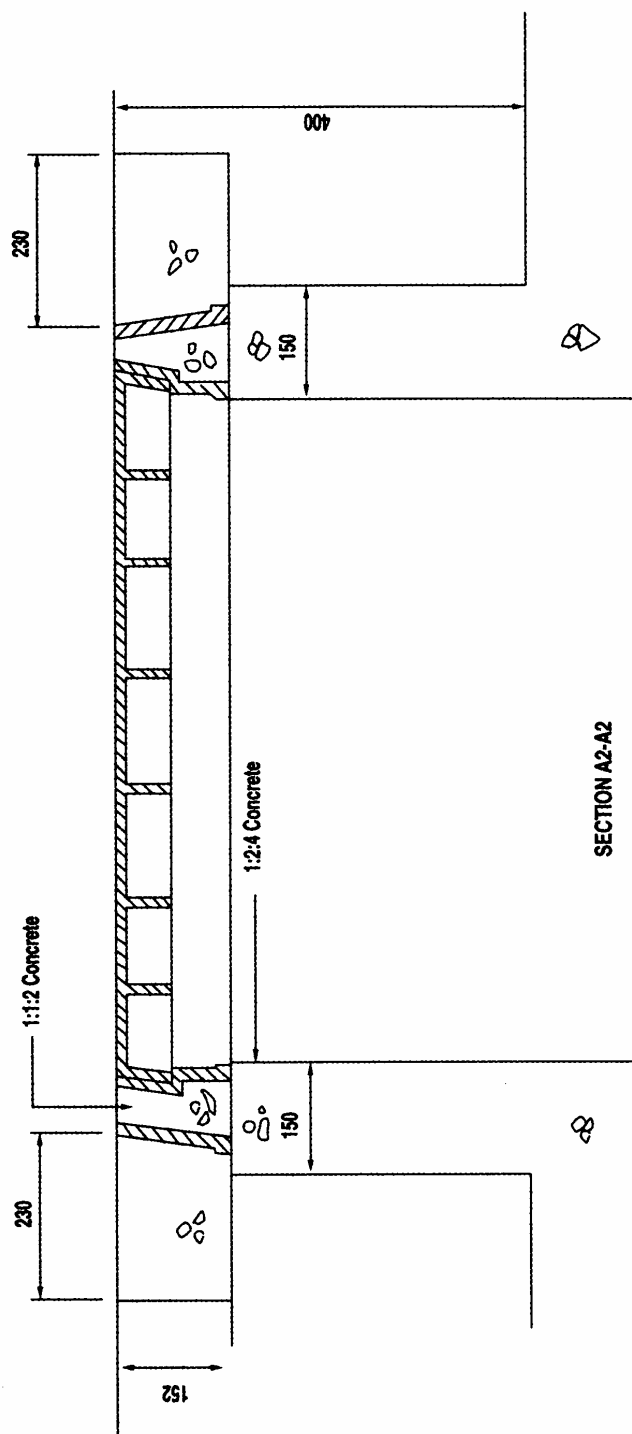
MANHOLE DRAWINGS - TYPE MX1 & MX2
